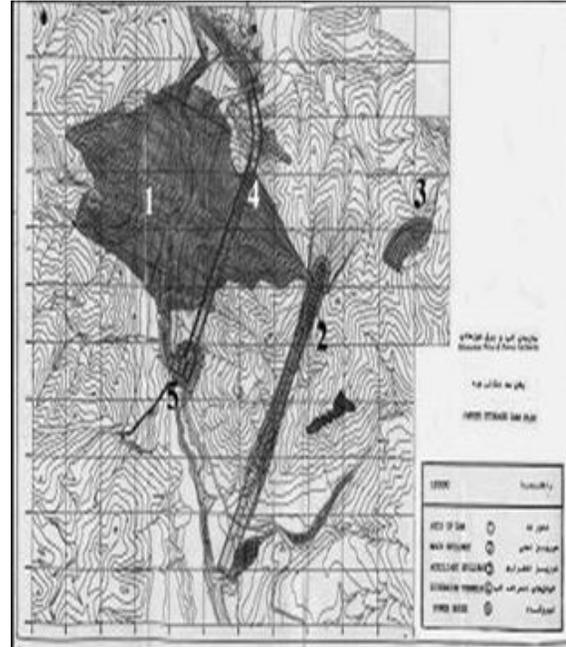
The plan of layout of Jere dam and the related structures[5].
